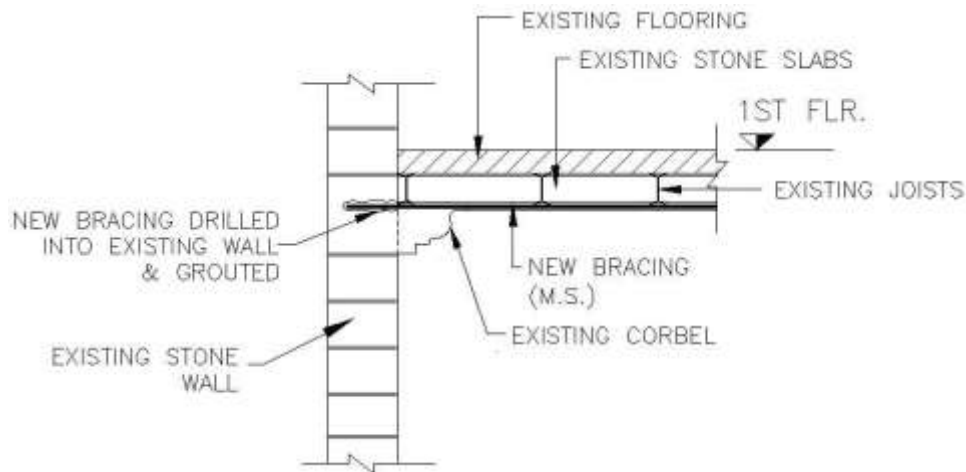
Sectional Details of Anchoring of Diagonal Floor Bracing in Walls
